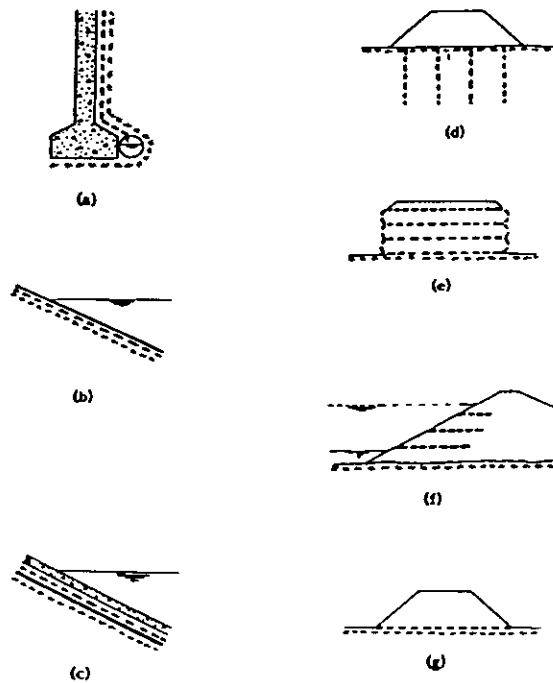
Examples of geotextiles acting as drains: (1) gravity drainage: (a) vertical drain along a wall, (b) geotextile below a geomembrane, (c) geotextile between concrete lining and geomembrane; (2) drainage by pressure: (d) vertical drain, (e) horizontal drain in a geotextile reinforced embankment, (f) horizontal drains of a dam, (g) horizontal drain under an embankment.
